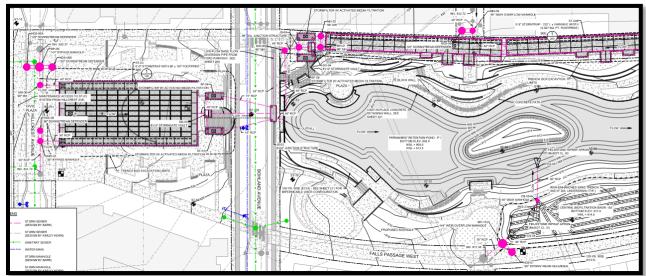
Preliminary Stormwater Layout for the Central Water Feature (North)
